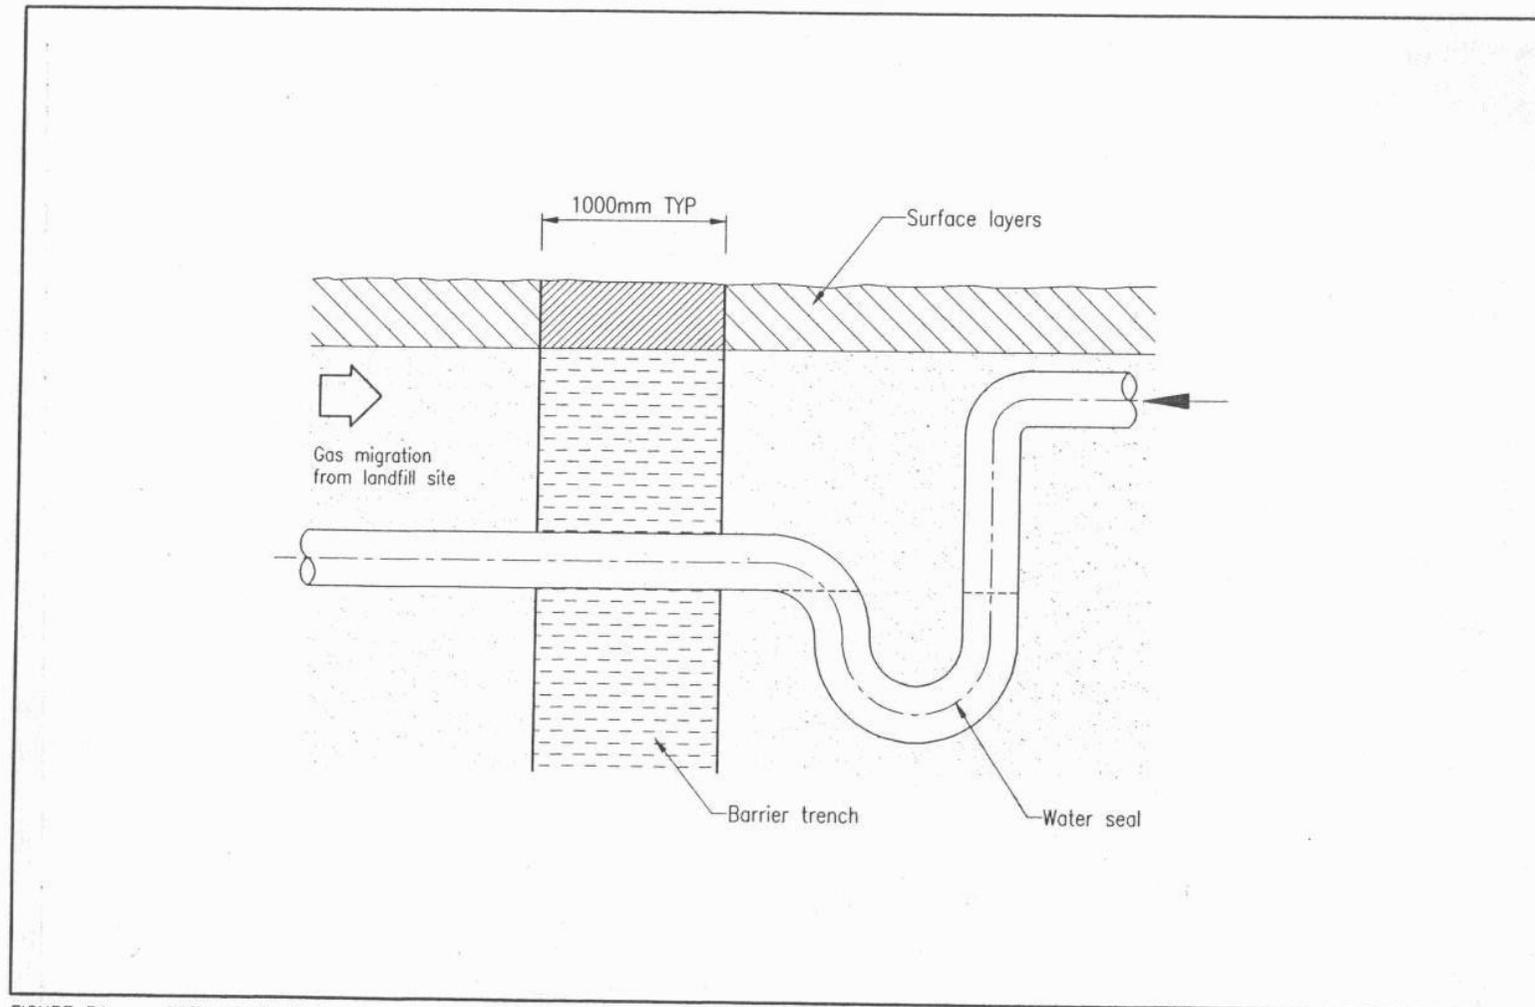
OPEN CONDUIT PROTECTION BY WATER SEAL (LONGITUDINAL SECTION)
